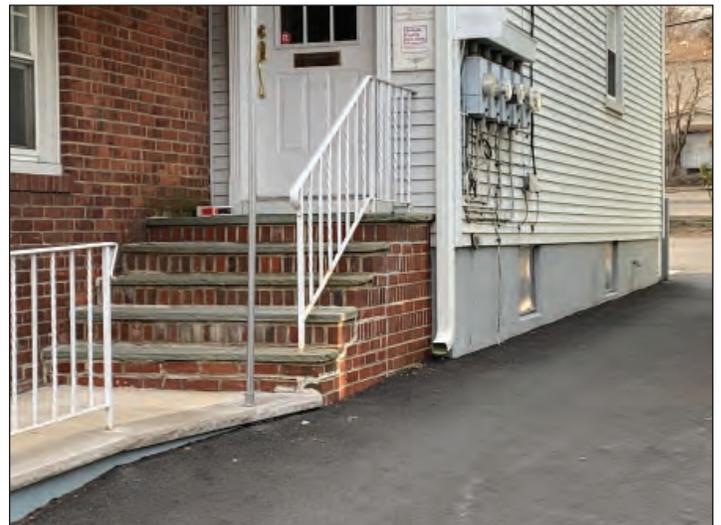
Entrance to rear building section. Not accessible to mobility impaired. Awning support pole obstructing path from driveway.
